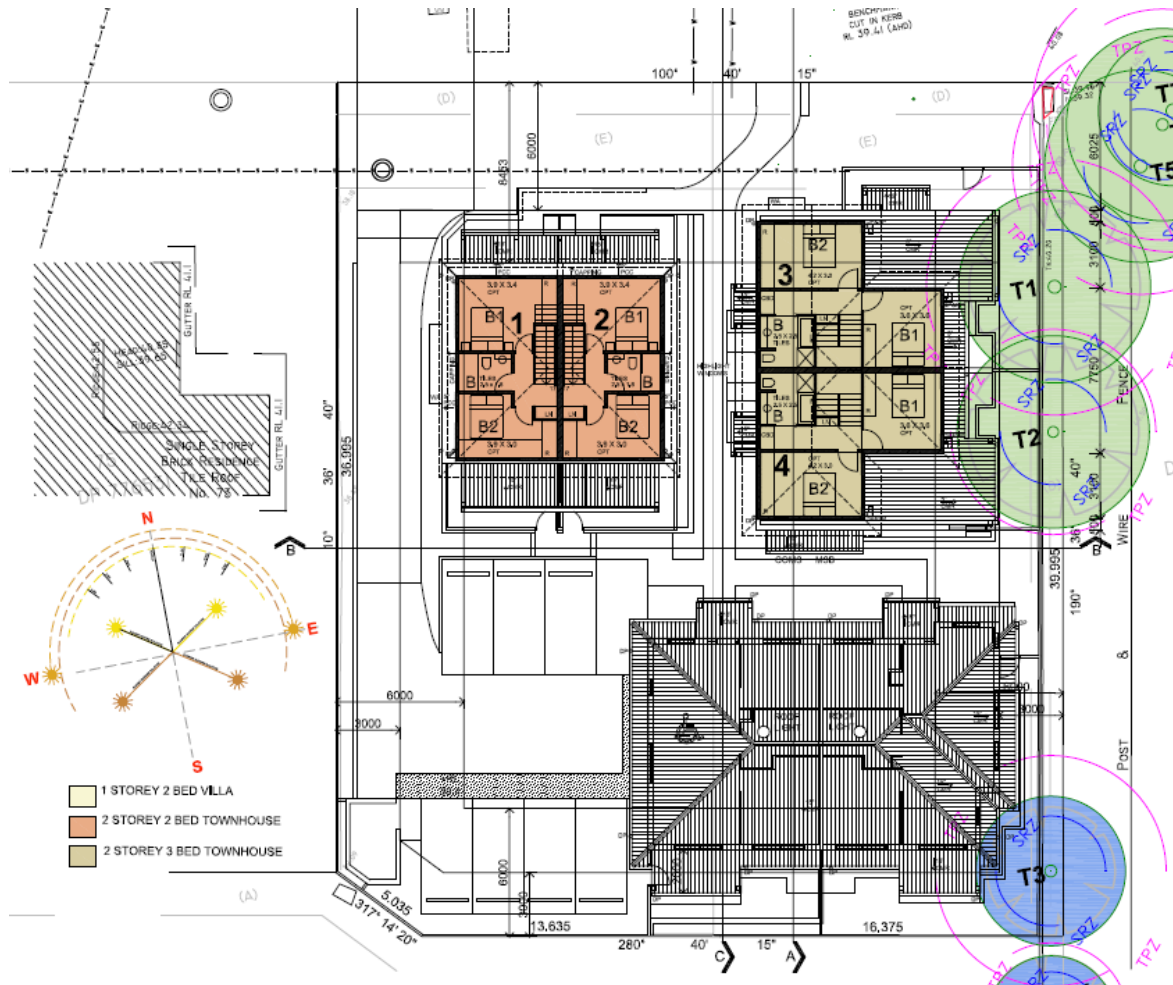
Extract from Architectural Plans – General Arrangement Plan – First Level (Source: Barry Rush and Associates, dated 03/05/2023)
